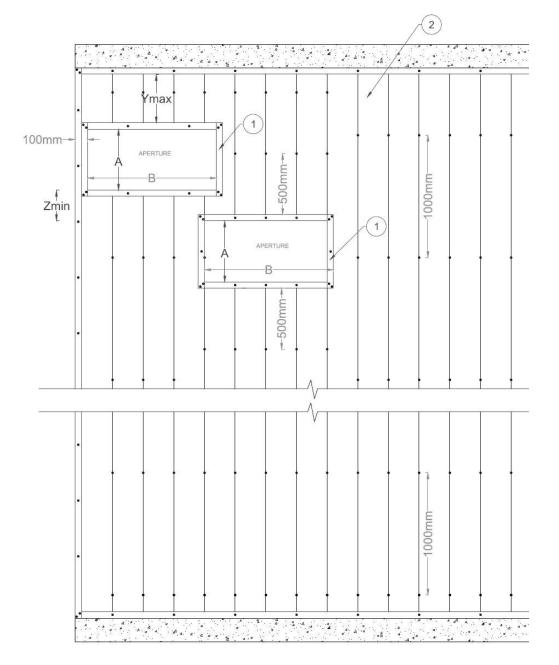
Vertical Speedpanel arrangement with multiple apertures within wall
